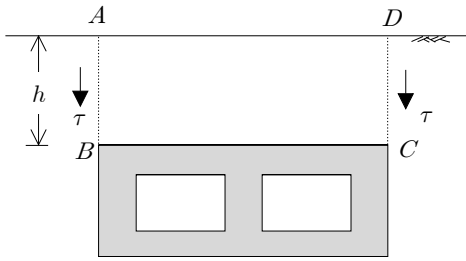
Reinforced concrete culvert and deformation of soil mass above the culvert
